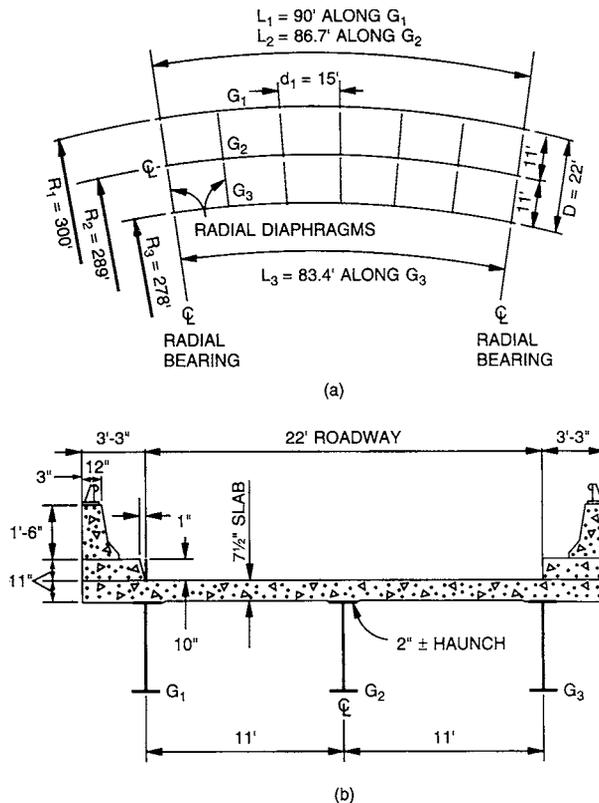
Two-lane highway bridge with curved stringers. (a) Framing plan. (b) Typical cross section.
